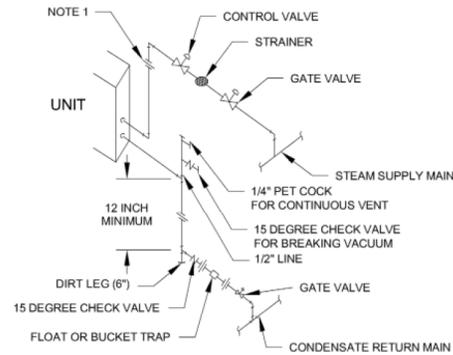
Standard steam pipe layout for horizontal coil arrangement
